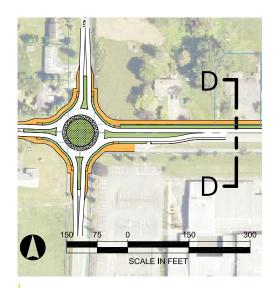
Proposed 172nd Street NE plan at 11th Ave NE.
